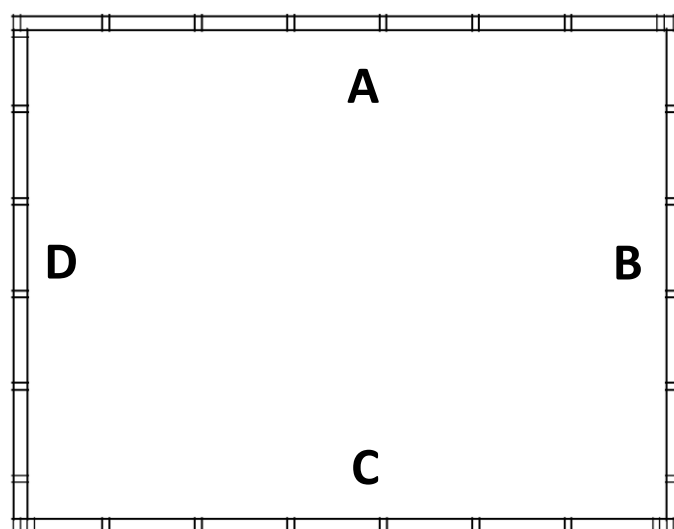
Stud framing set-out. A = non-rated long wall; B = free wall; C = fire-rated wall; D = fixed wall
